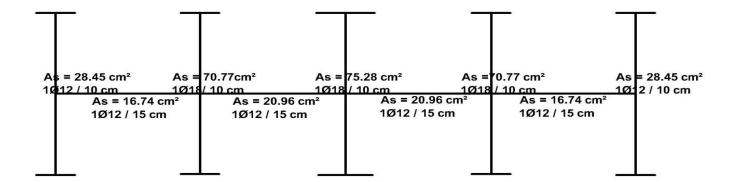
column strip reinforcement for frame 1 in slab1 X-dir
